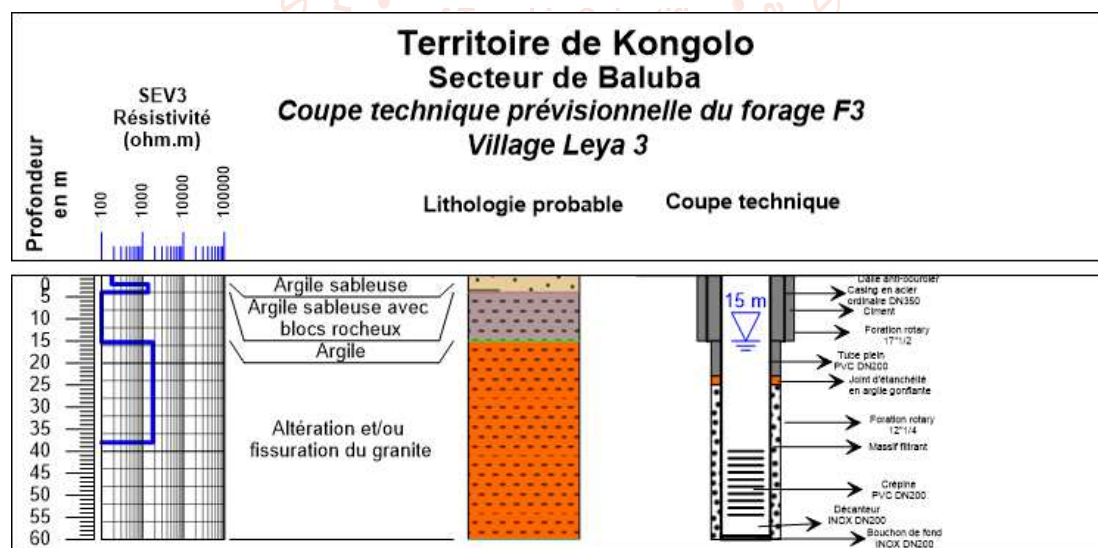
Preliminary technical cross-section of drilling f₃ / leya 3
